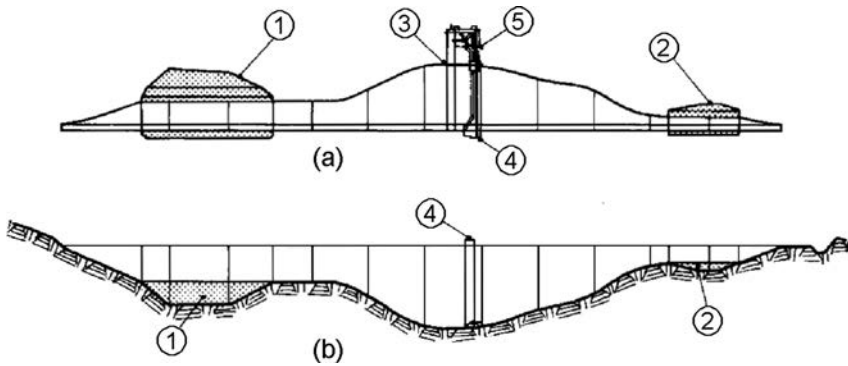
Plan (a) and longitudinal section (b) of the Olivenhain dam (after Dunstan, 2002). (1) Left abutment RCC foundation shaping block; (2) right abutment RCC foundation shaping block; (3) spillway; (4) intake-outlet tower; (5) intake-outlet conduit.
